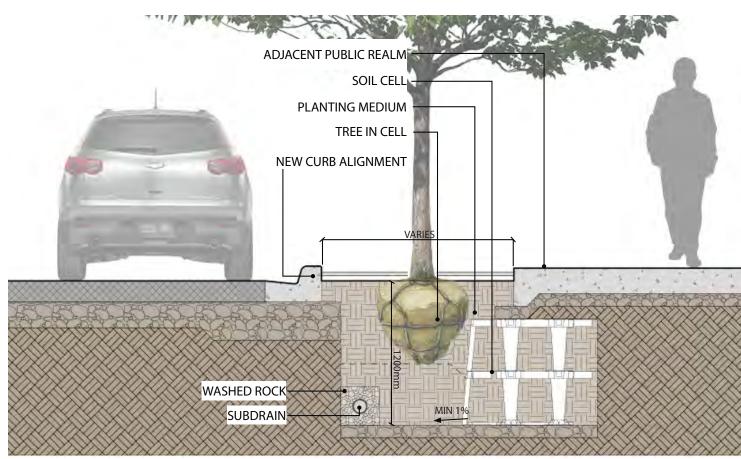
TREE PLANTING SOIL CELLS CONCEPT SECTION
